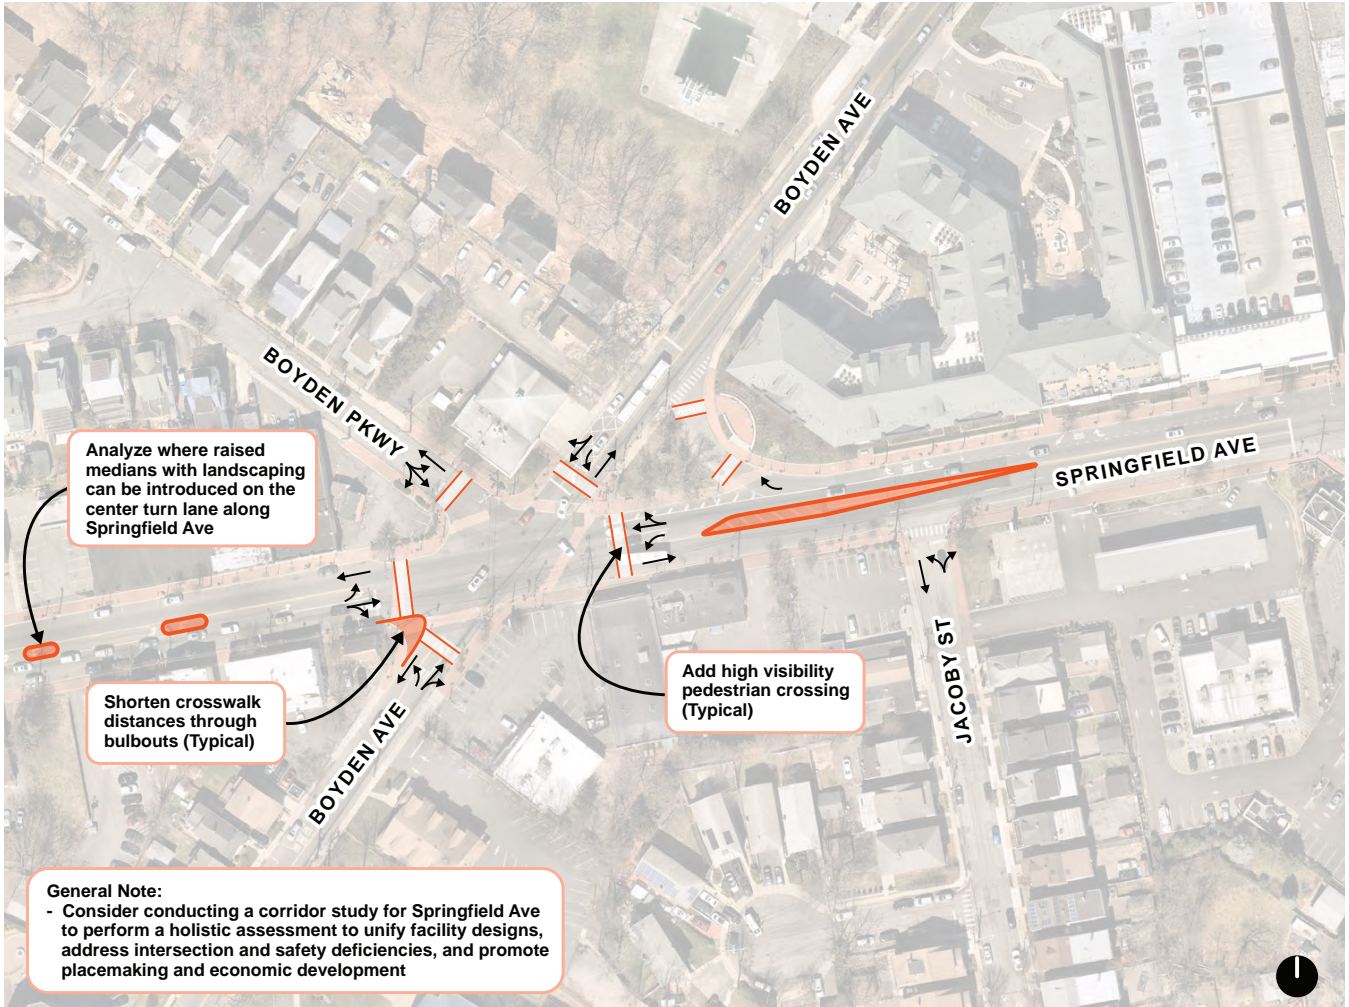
Conceptual Plan for Springfield Avenue between Boyden Avenue and Jacoby Street
